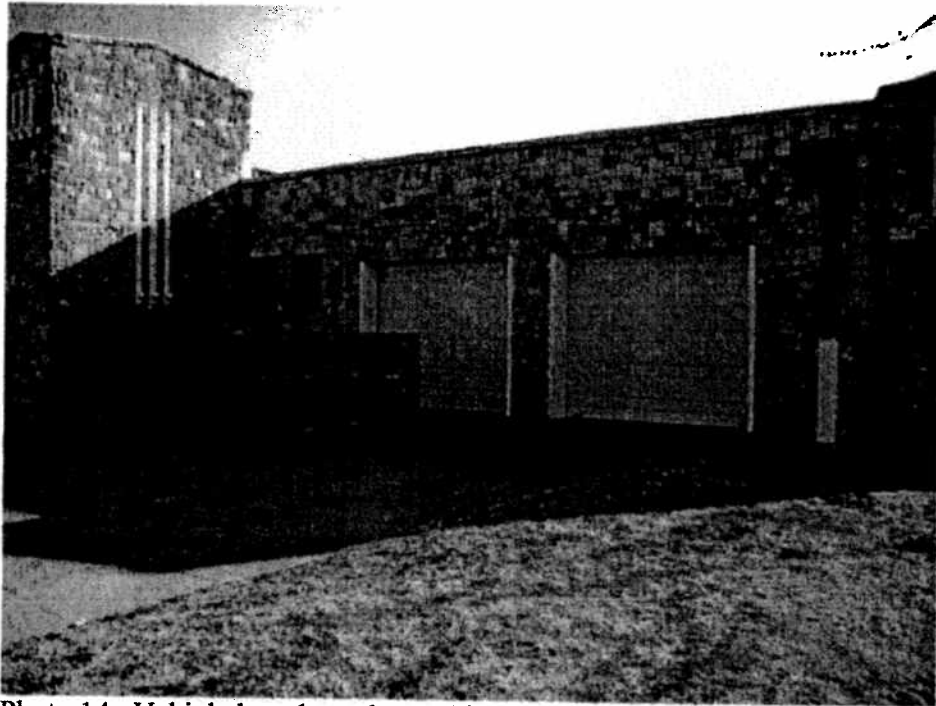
Vehicle bay doors located in the southwest corner of the facility looking northeast.
